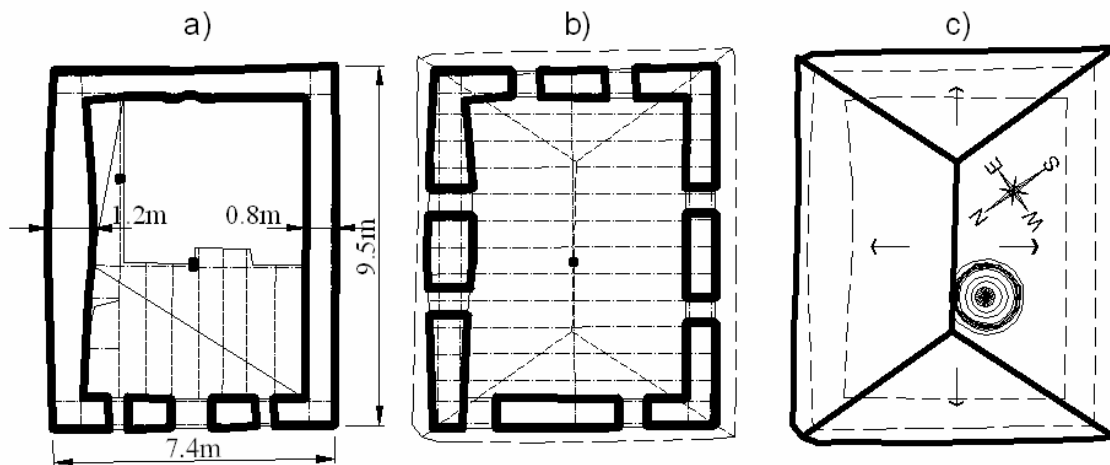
a) ground floor level with mahfil structure above, b) mahfil floor level with timber ceiling structure above, c) roof plan
